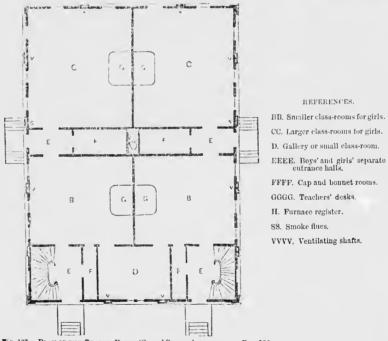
Plan of the Ground Floor (Girls' School), adapted to Fig. 136.
